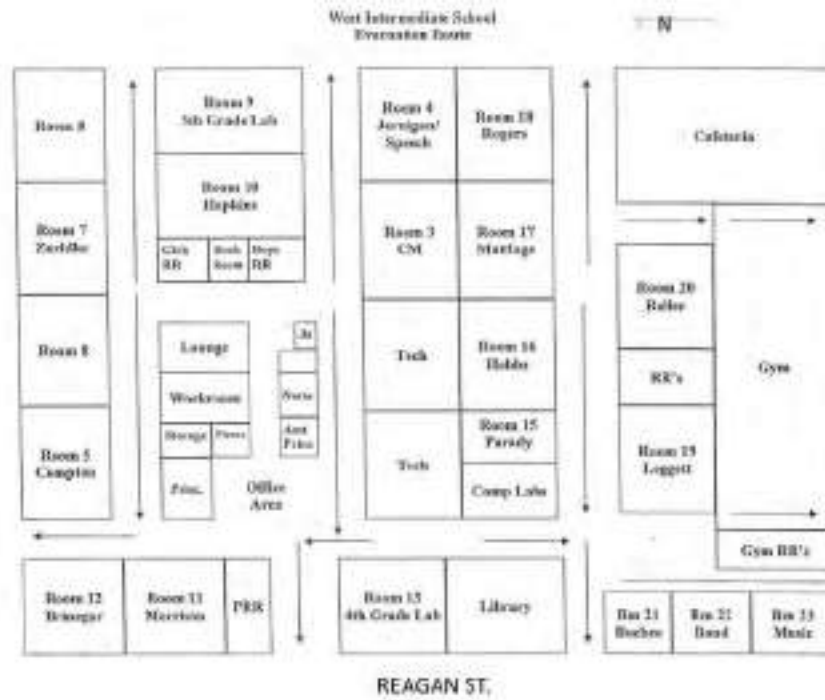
West Intermediate School Room Layout from Evacuation Plan
